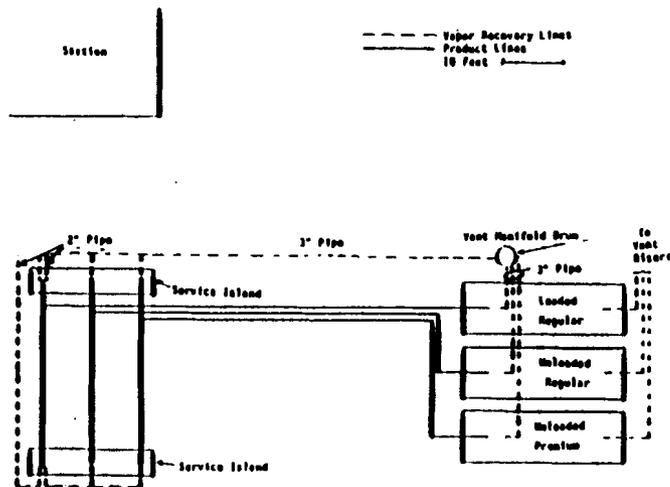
Stage II Underground Piping Layouts for Model Plant 4
